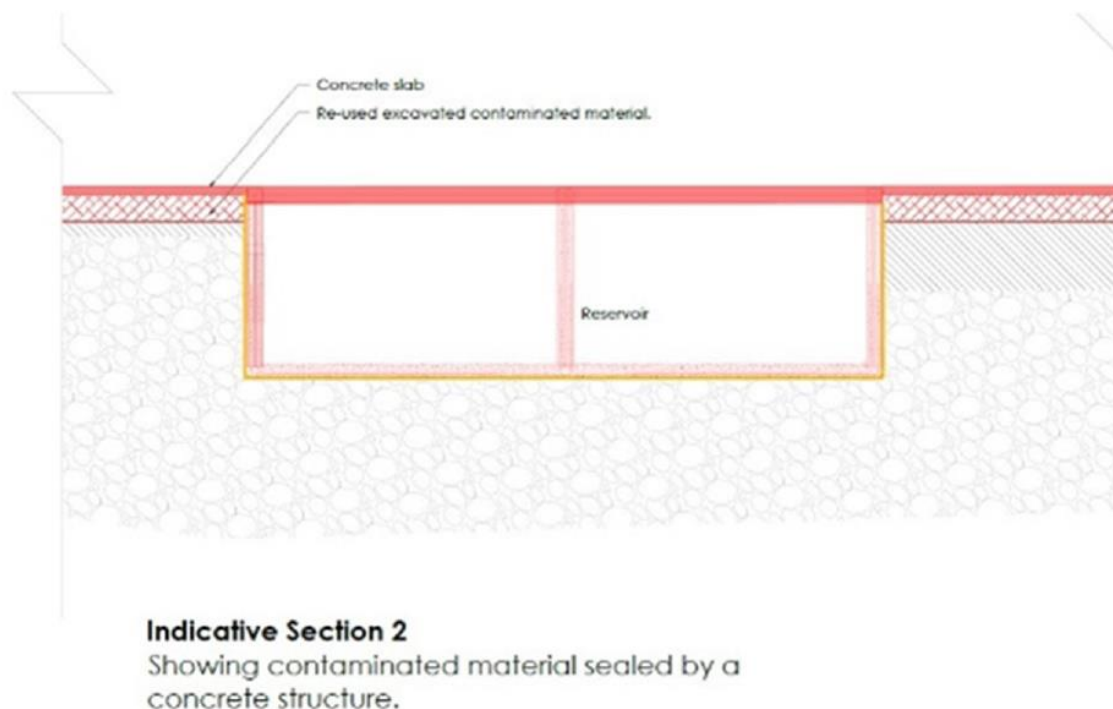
Section of the proposed levelling and excavation of reservoir within the industrial area (area X) (Source: PDS)
